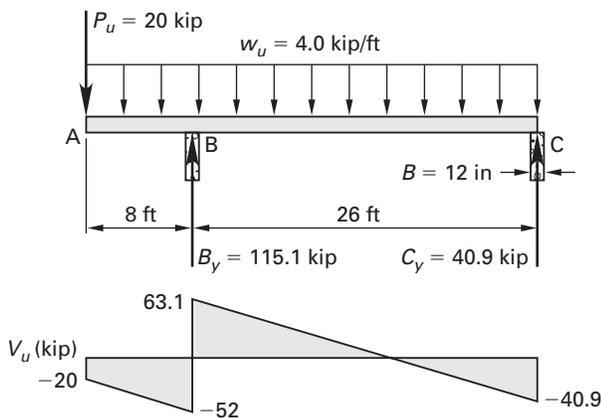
Shear Design Provisions for a Slender Reinforced Concrete Beam
